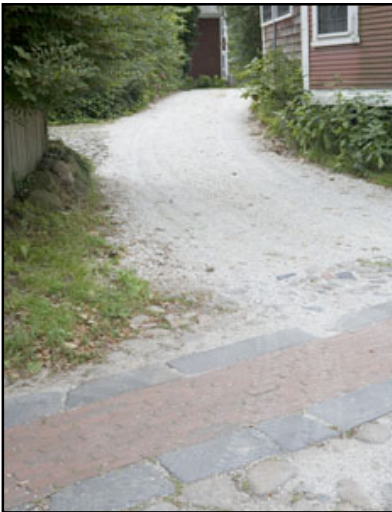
Permeable pavers - shell, brick, and cobblestones.
